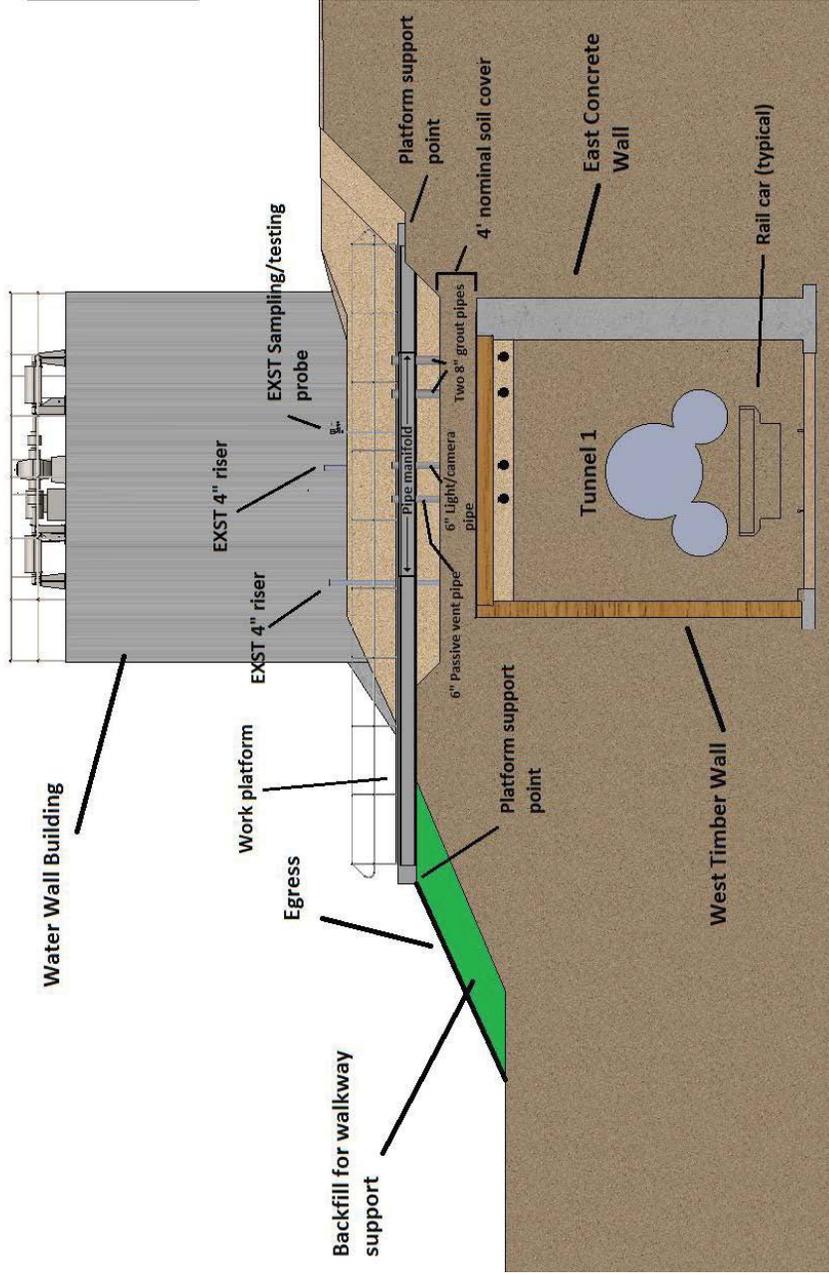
South Elevation of Tunnel Number 1 Grouting Equipment – Platform and Piping
